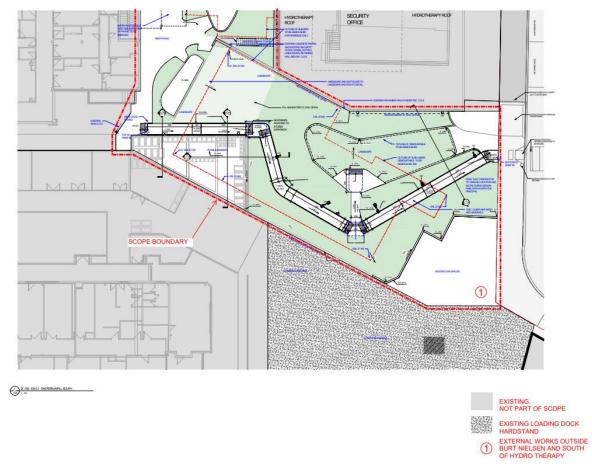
Extract of proposed plans showing External Works – Eastern Infill Area – Sheet 2 Source: Jacobs Architects
